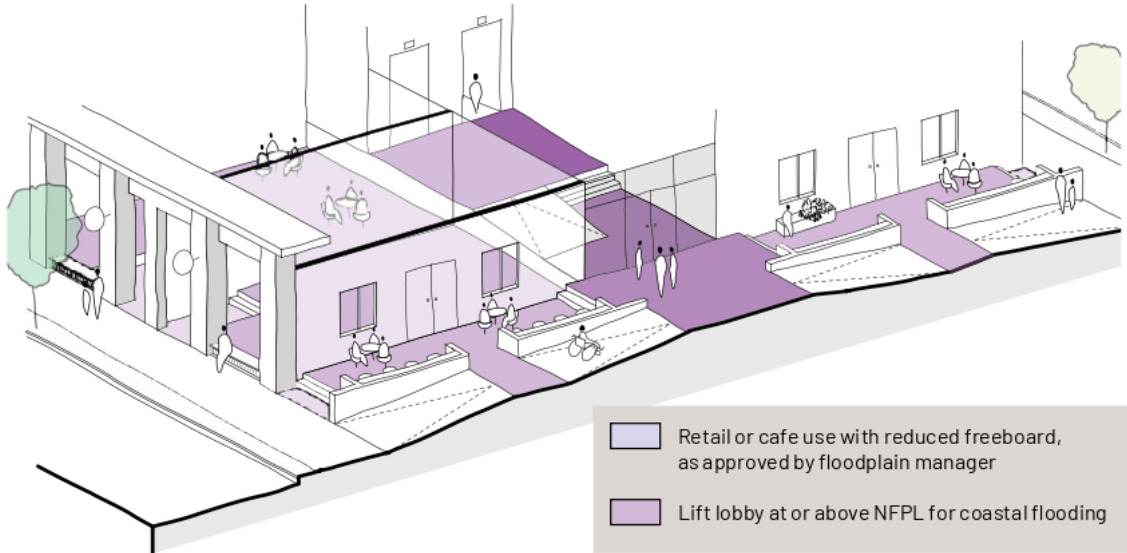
The laneway is an opportunity to provide universal access up to an elevated building entry and the main lift lobby by raising a portion of the laneway.
